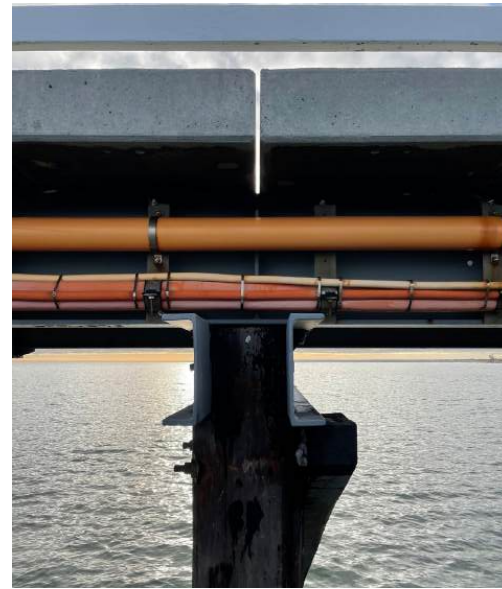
Detail view of half-cap detail, Section 2, Busselton Jetty. H+H Architects, 2022.
